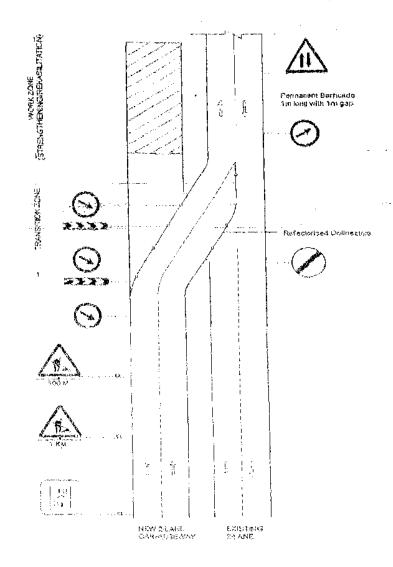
Typical 4 - Laning Construction and crossover to Existing Road Detail in Rural Area
